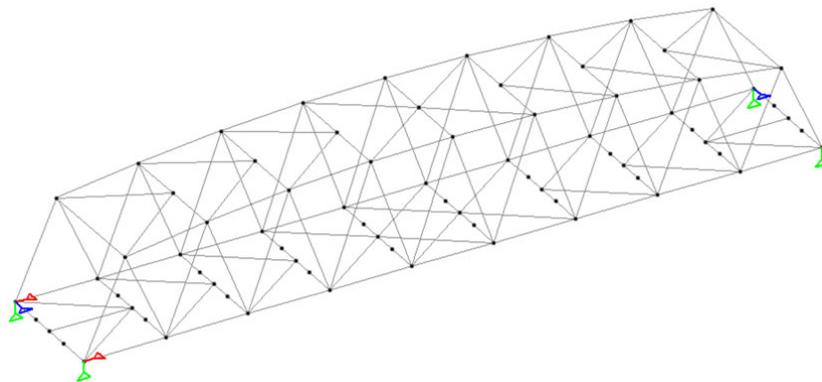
3-Dimensional FEM model Curry Railway crossing Steel truss for Mumbai
